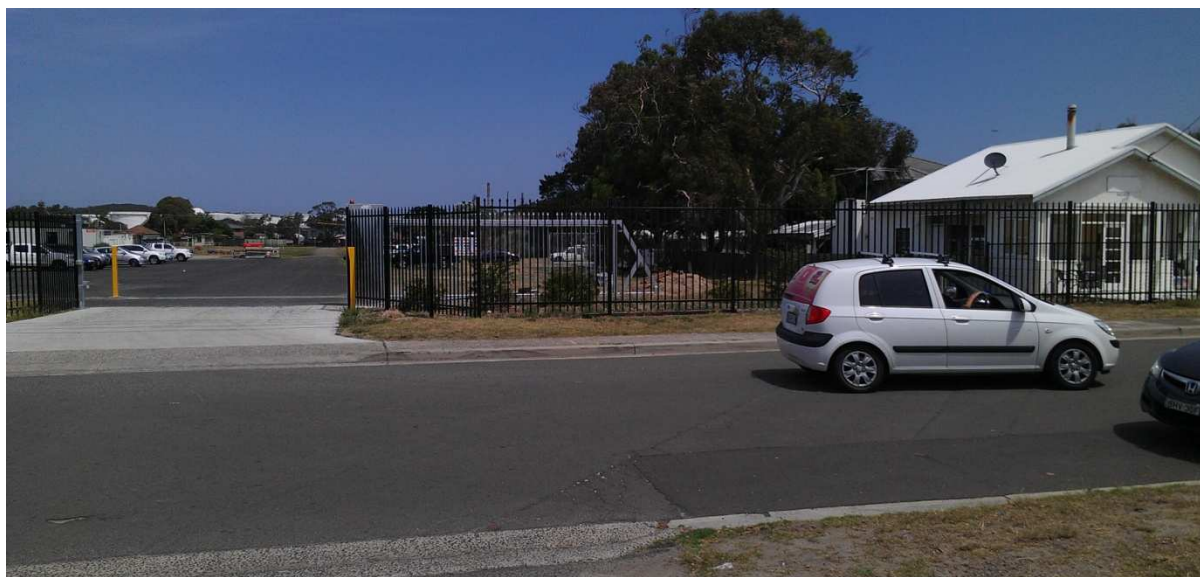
Construction Lay-down Area at No.36-46 Prince Charles Parade, Kurnell
